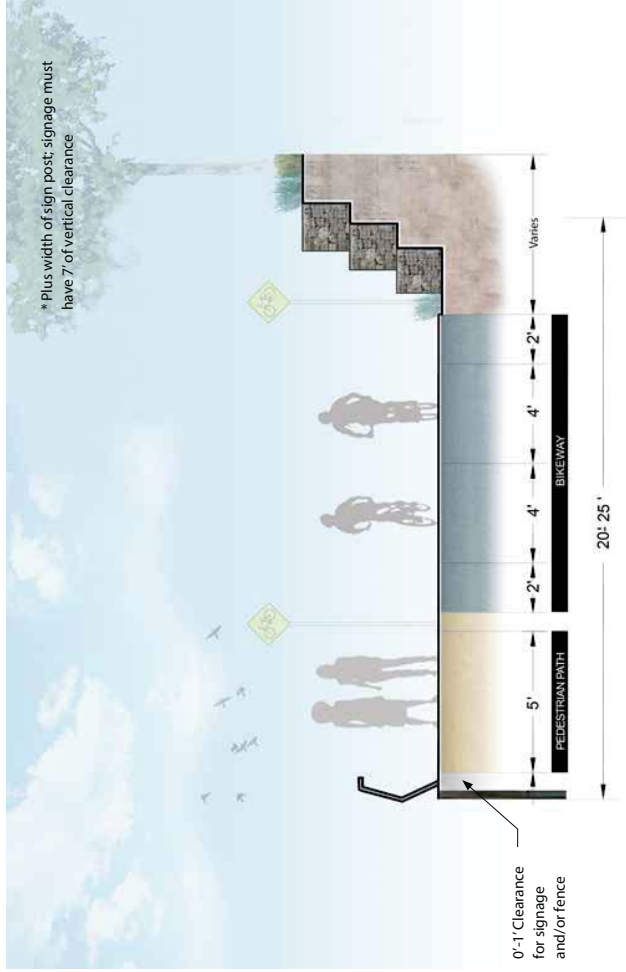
Moorpark Street to Fulton Avenue - Typical Cross Section
